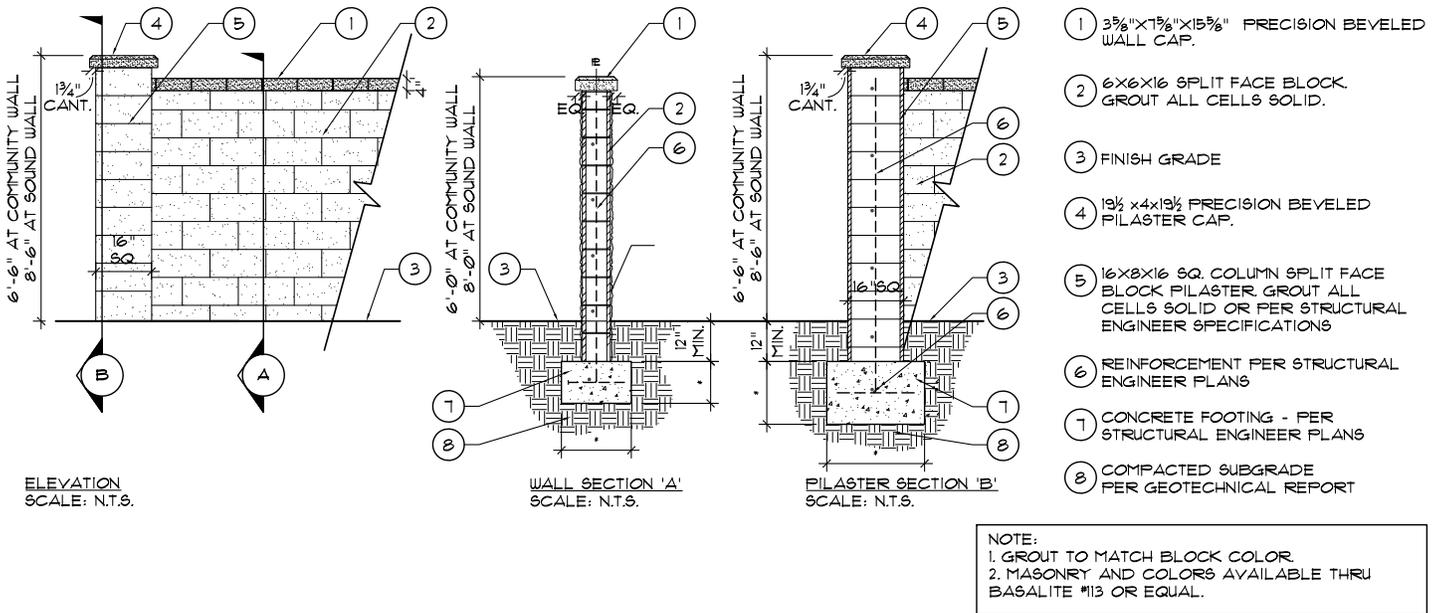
6'-0" Block Wall or 8'-0" Sound Wall
